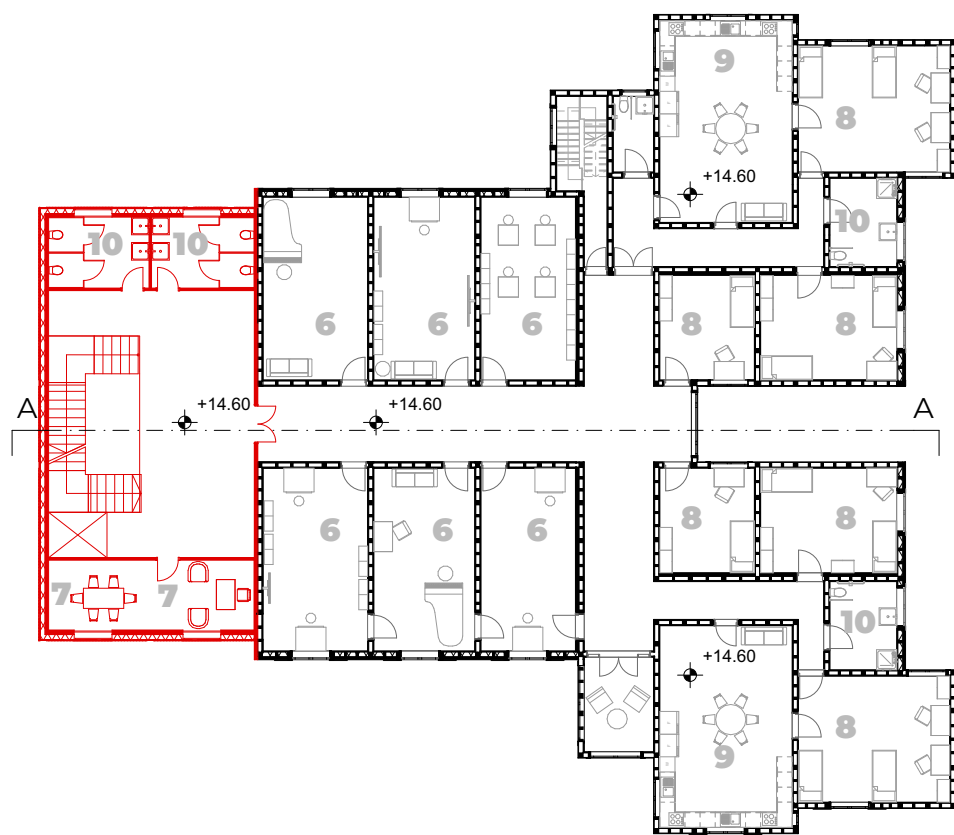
Third Floor Plan (Source: Created by the author, 2025)
